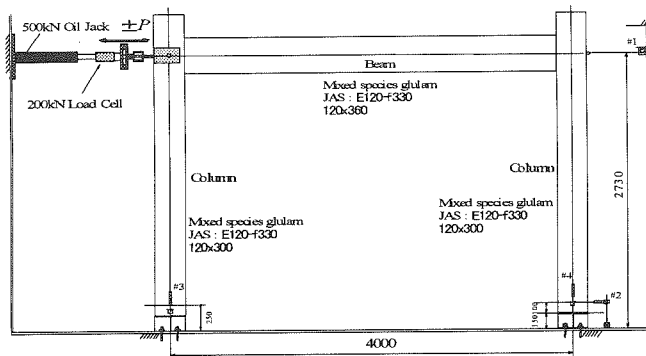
Test set-up for full-scale glulam portal frame specimen.
